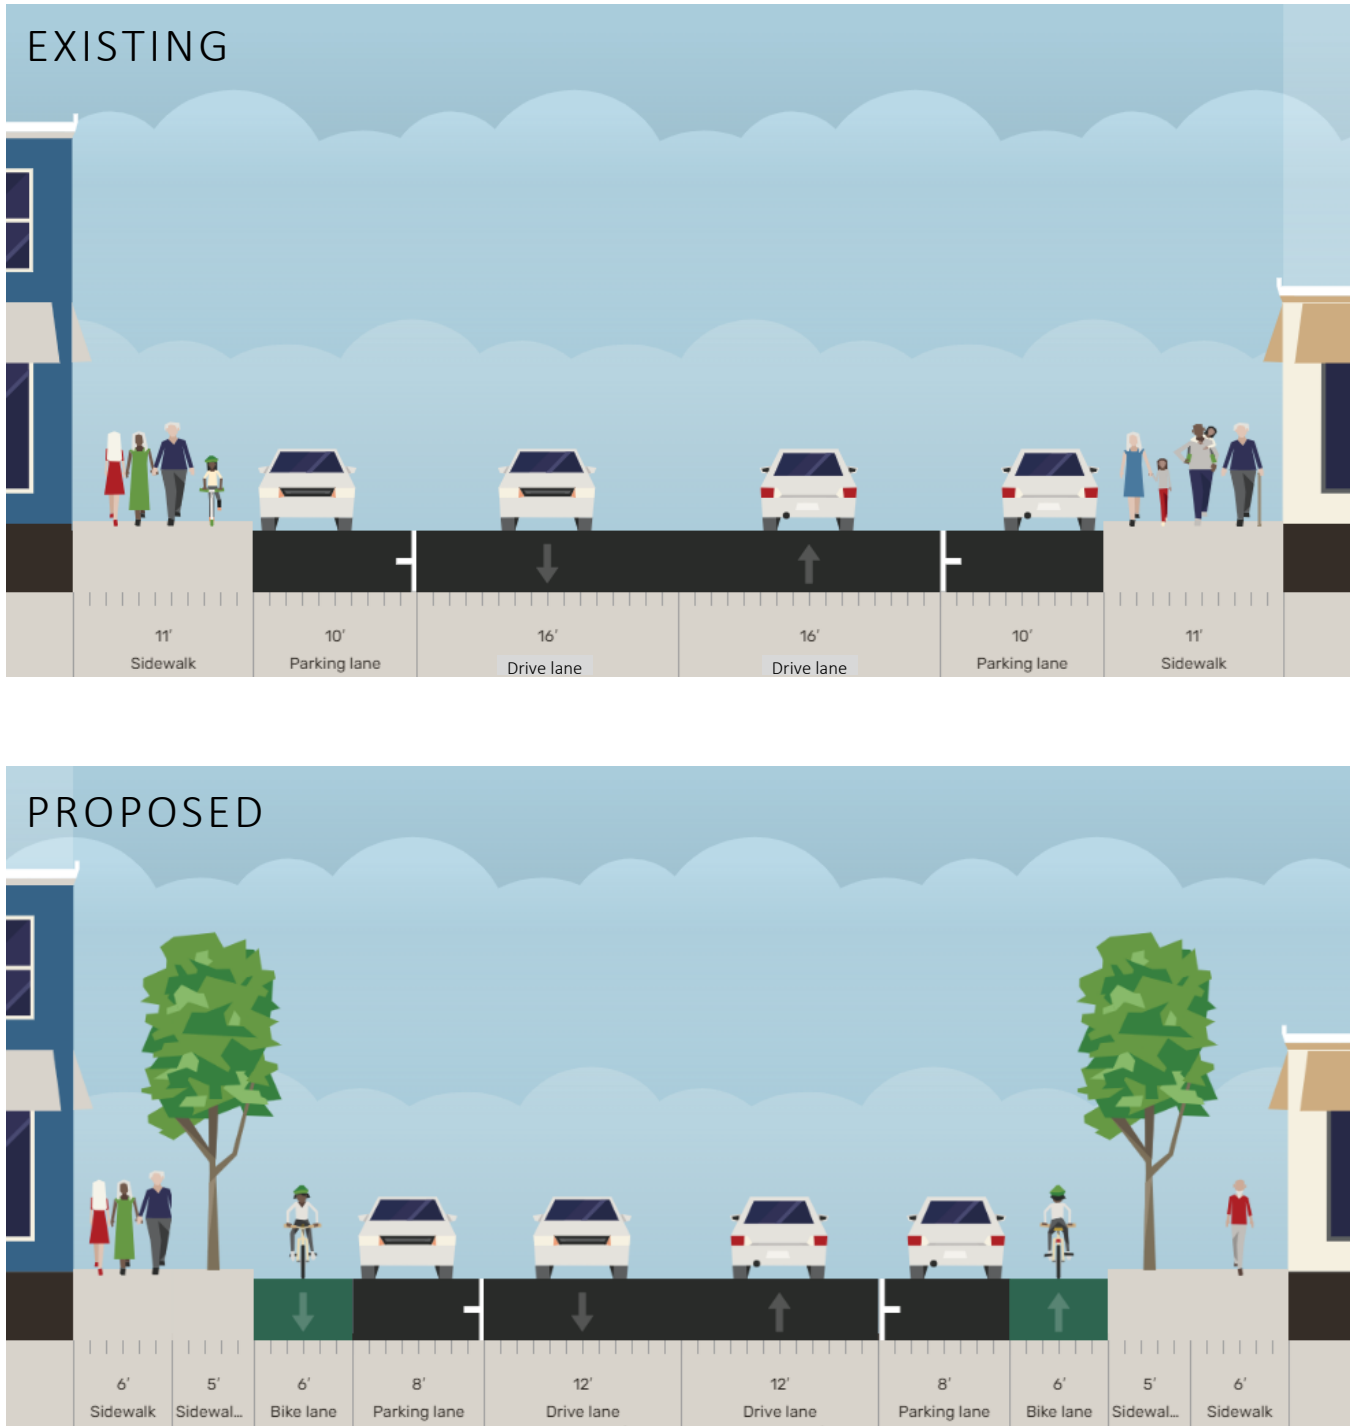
Michigan Avenue – Local Bike Connection Street Reconfiguration Section
